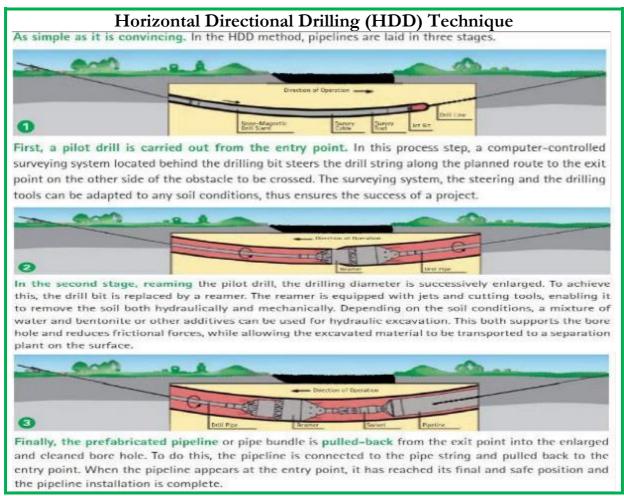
Pictures showing Horizontal Directional Drilling (HDD) Technique.
